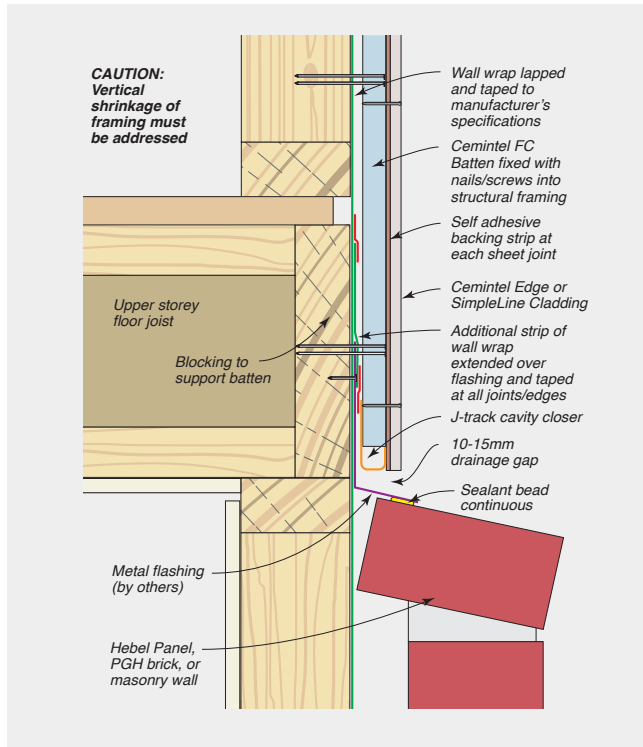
Junction of Cemintel Cladding with Alternative Cladding
